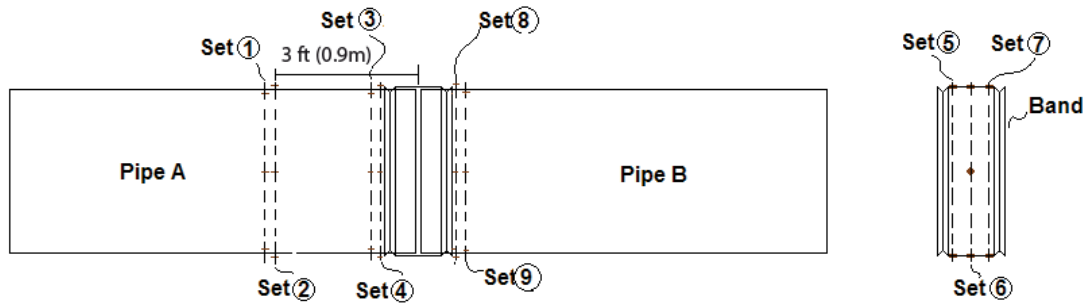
Strain gage scheme for the 36 in. (915mm) diameter corrugated steel pipe with O-rings.
